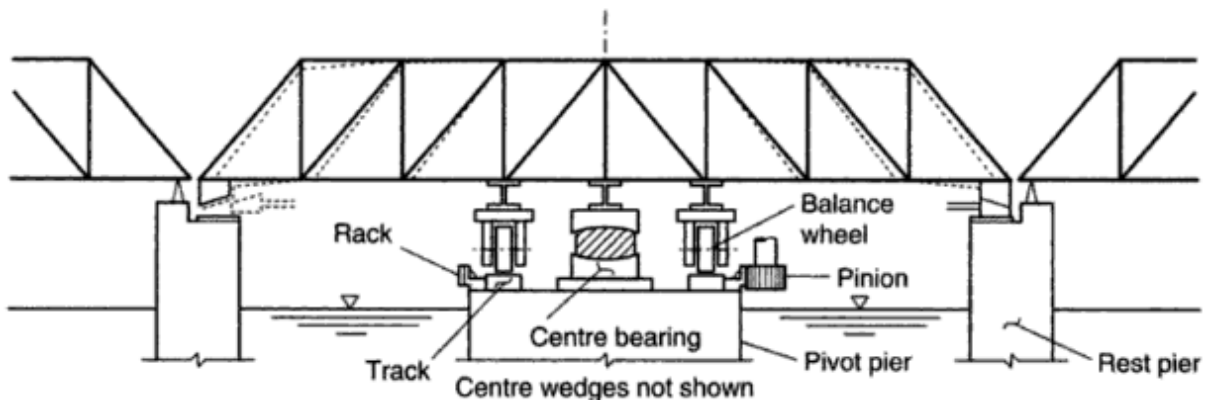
Centre bearing swing bridge (Ryall, Parke, & Harding, 2000)
